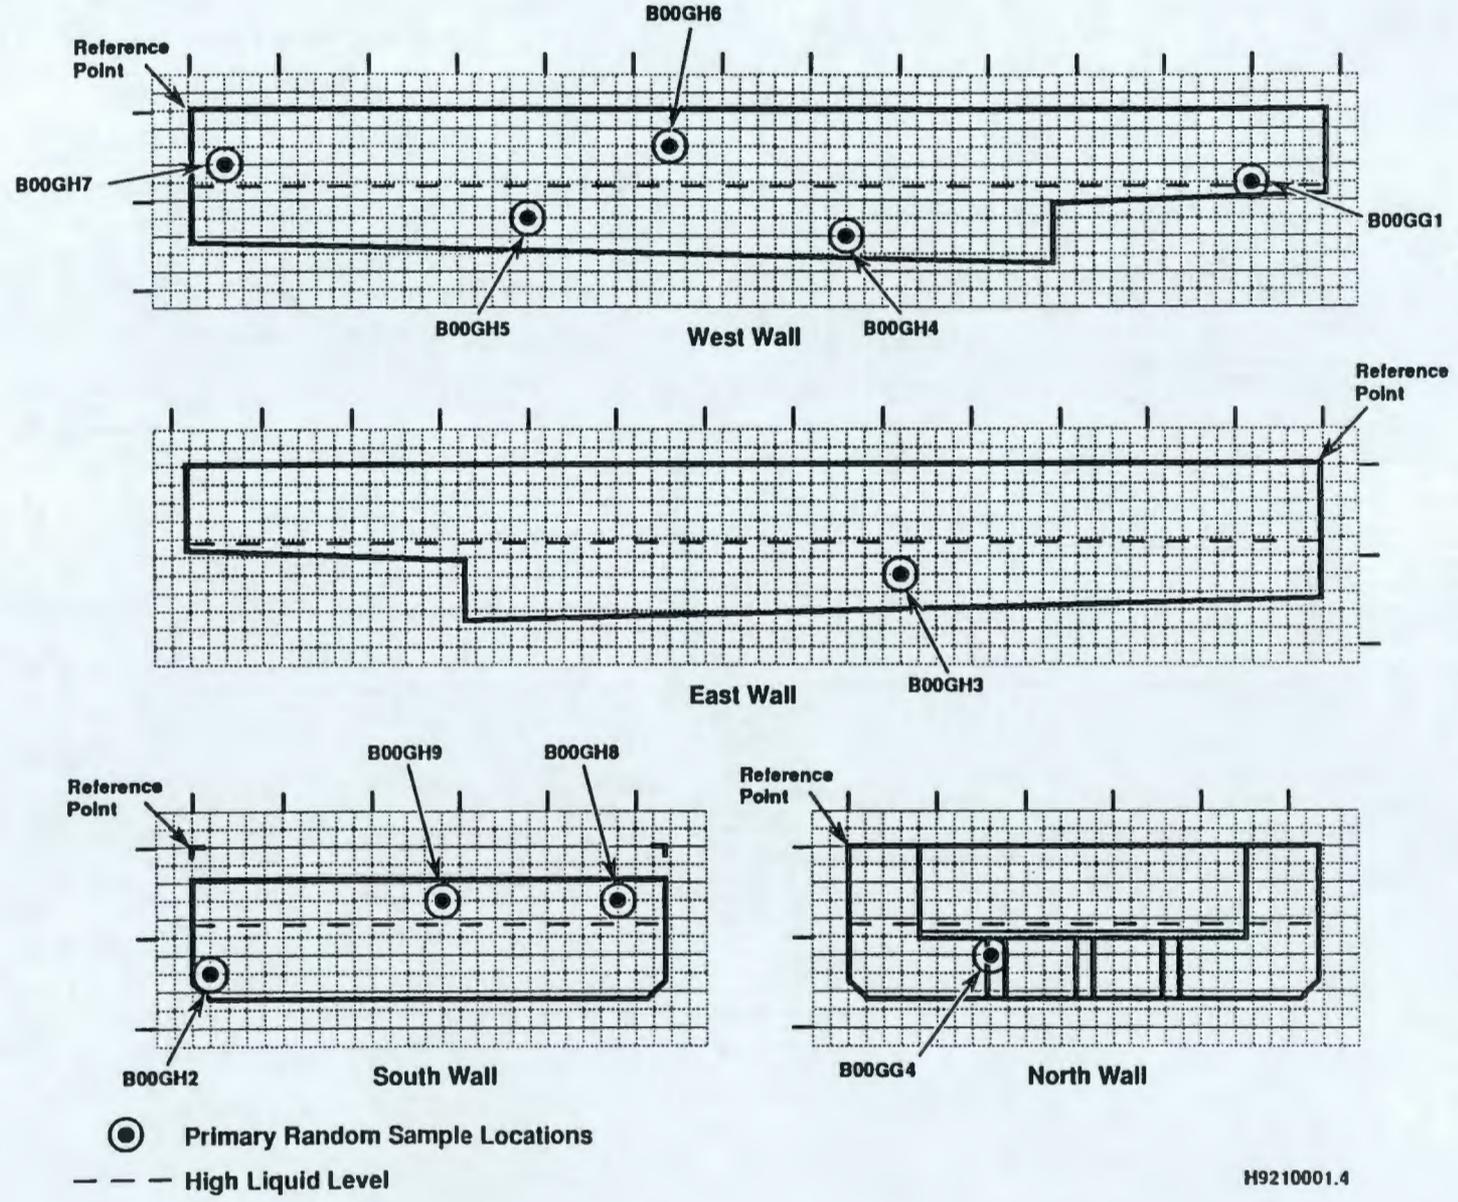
Basin 2 Interior Wall Concrete Sample Locations
